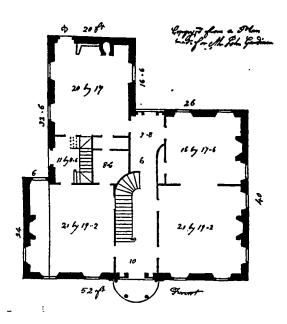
Gardner-White-Pingree house floor plan, Salem Massachusetts.
